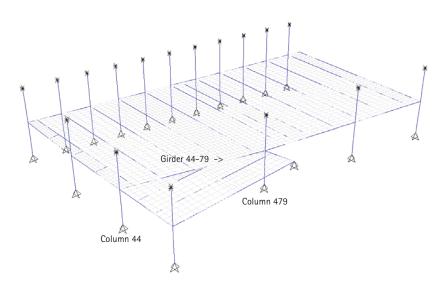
Undeformed SAP2000 model with Girder 44–79 connected to Column 79
